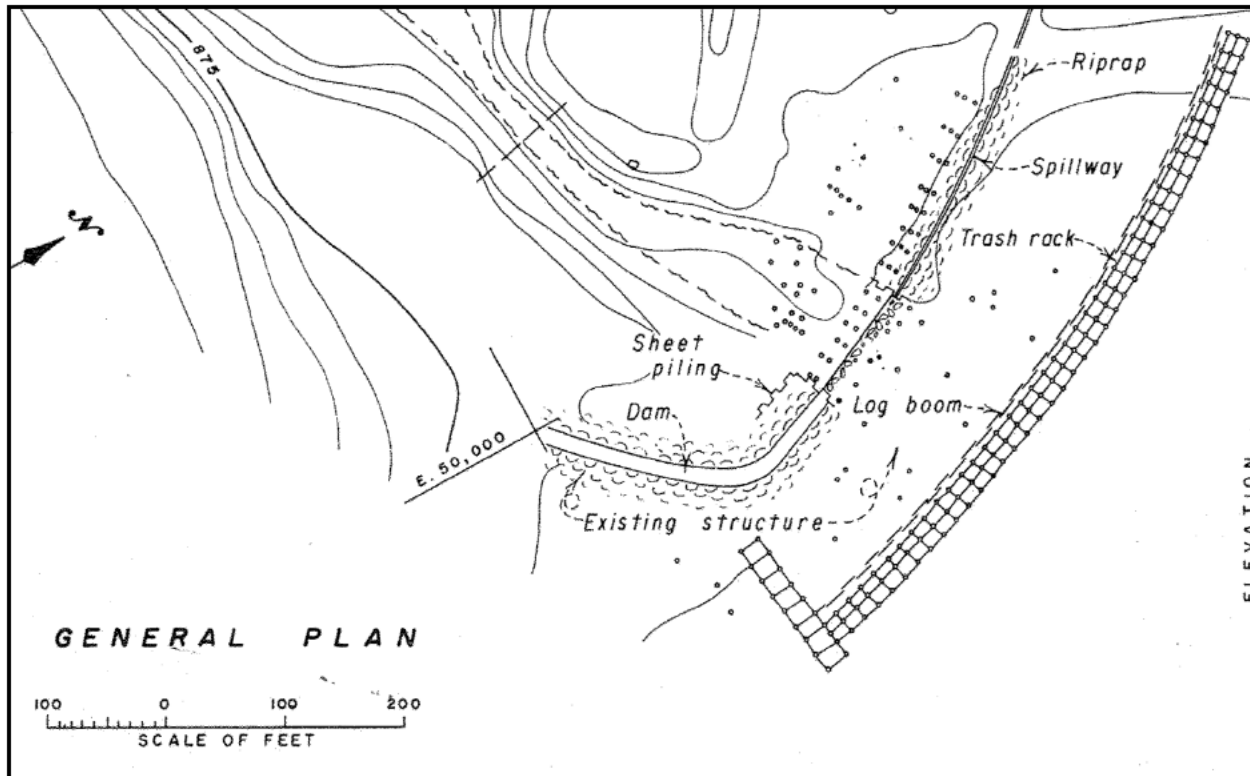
Plan of the Storage Dam in 1964. From USBR (1964).
